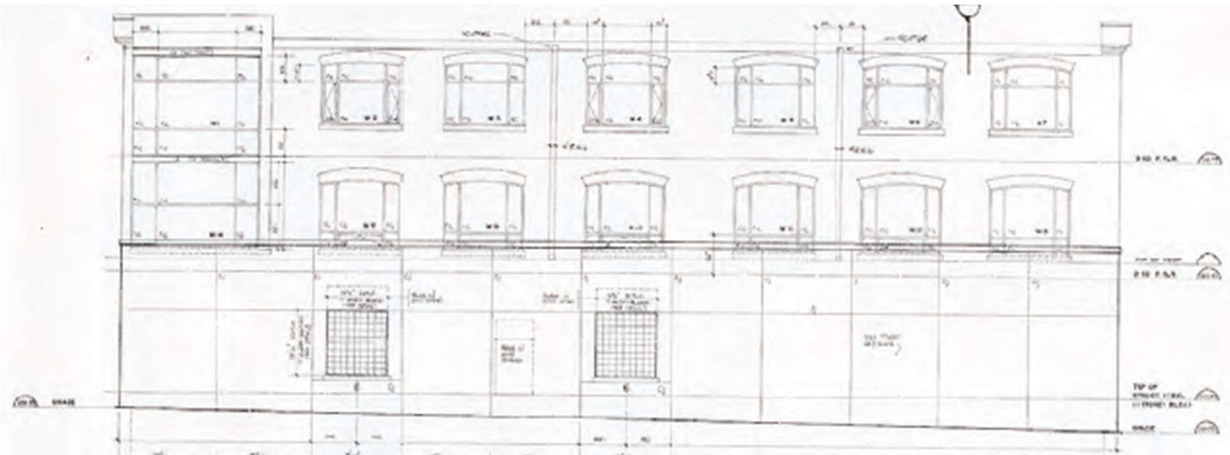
1990 building permit drawings, west elevation (Toronto Building Records).
